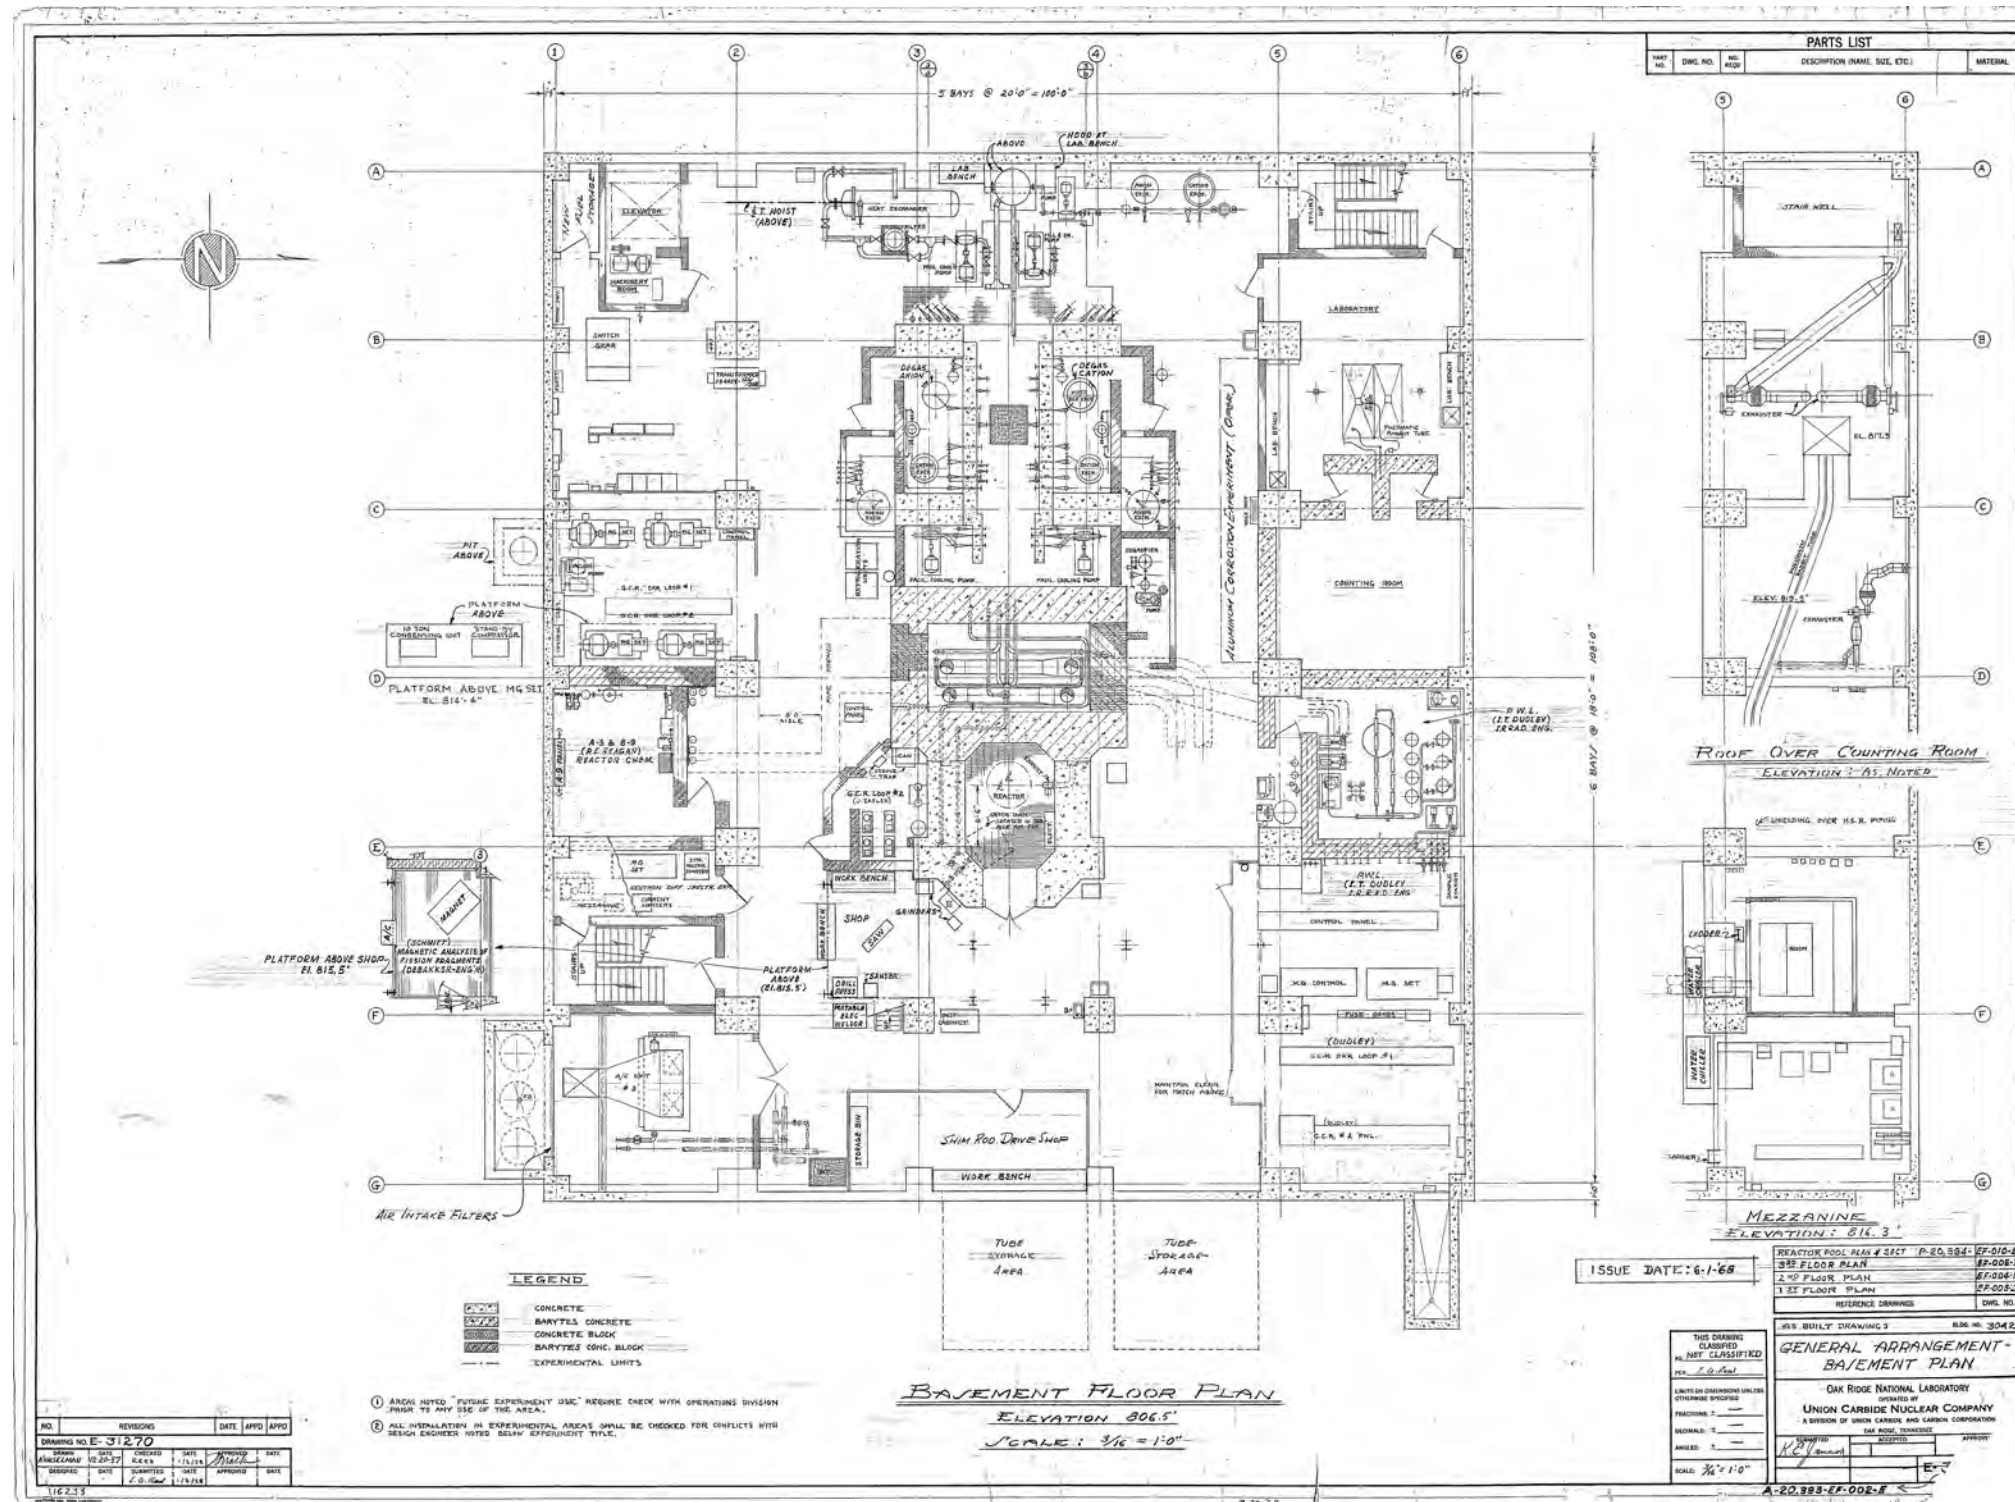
As built drawing showing the general arrangement of the basement plan in Building 3042 (Oak Ridge National Laboratory, December 20, 1957 [drawn date], June 1, 1968 [issue date, with revisions]).
